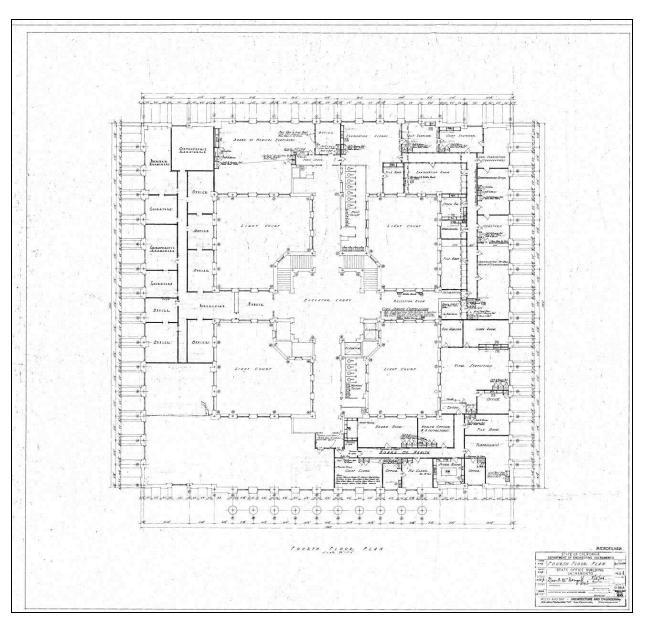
OB 1 Fourth Floor Plan. April 20, 1926.
